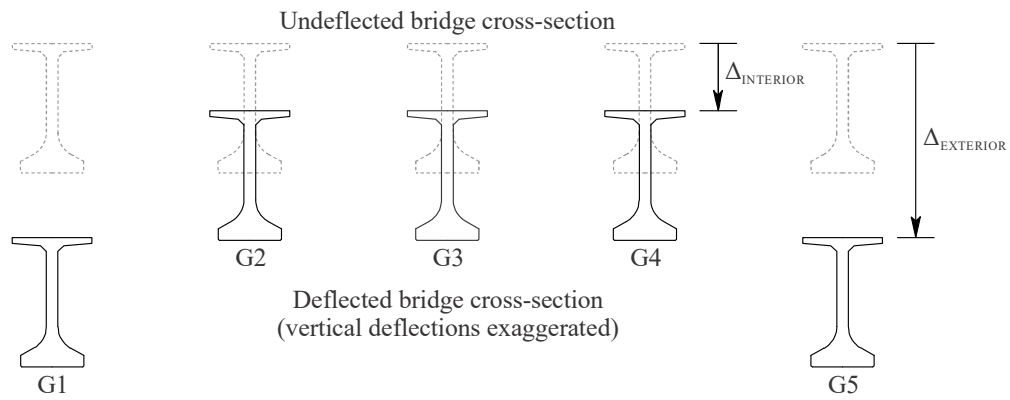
Bridge cross-section midspan deflection without interior bracing
